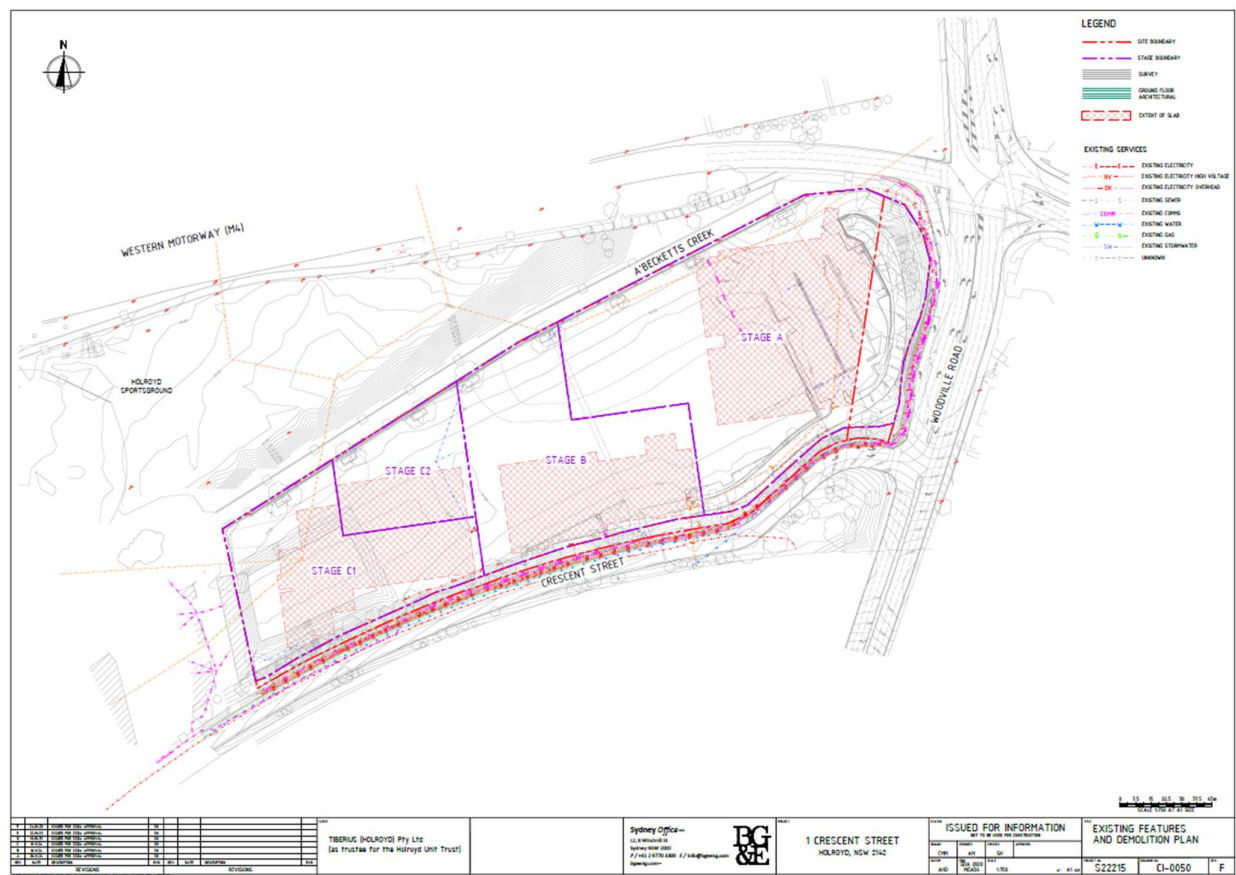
Early Enabling Works (All Stages): Existing Features and Demolition Plan
